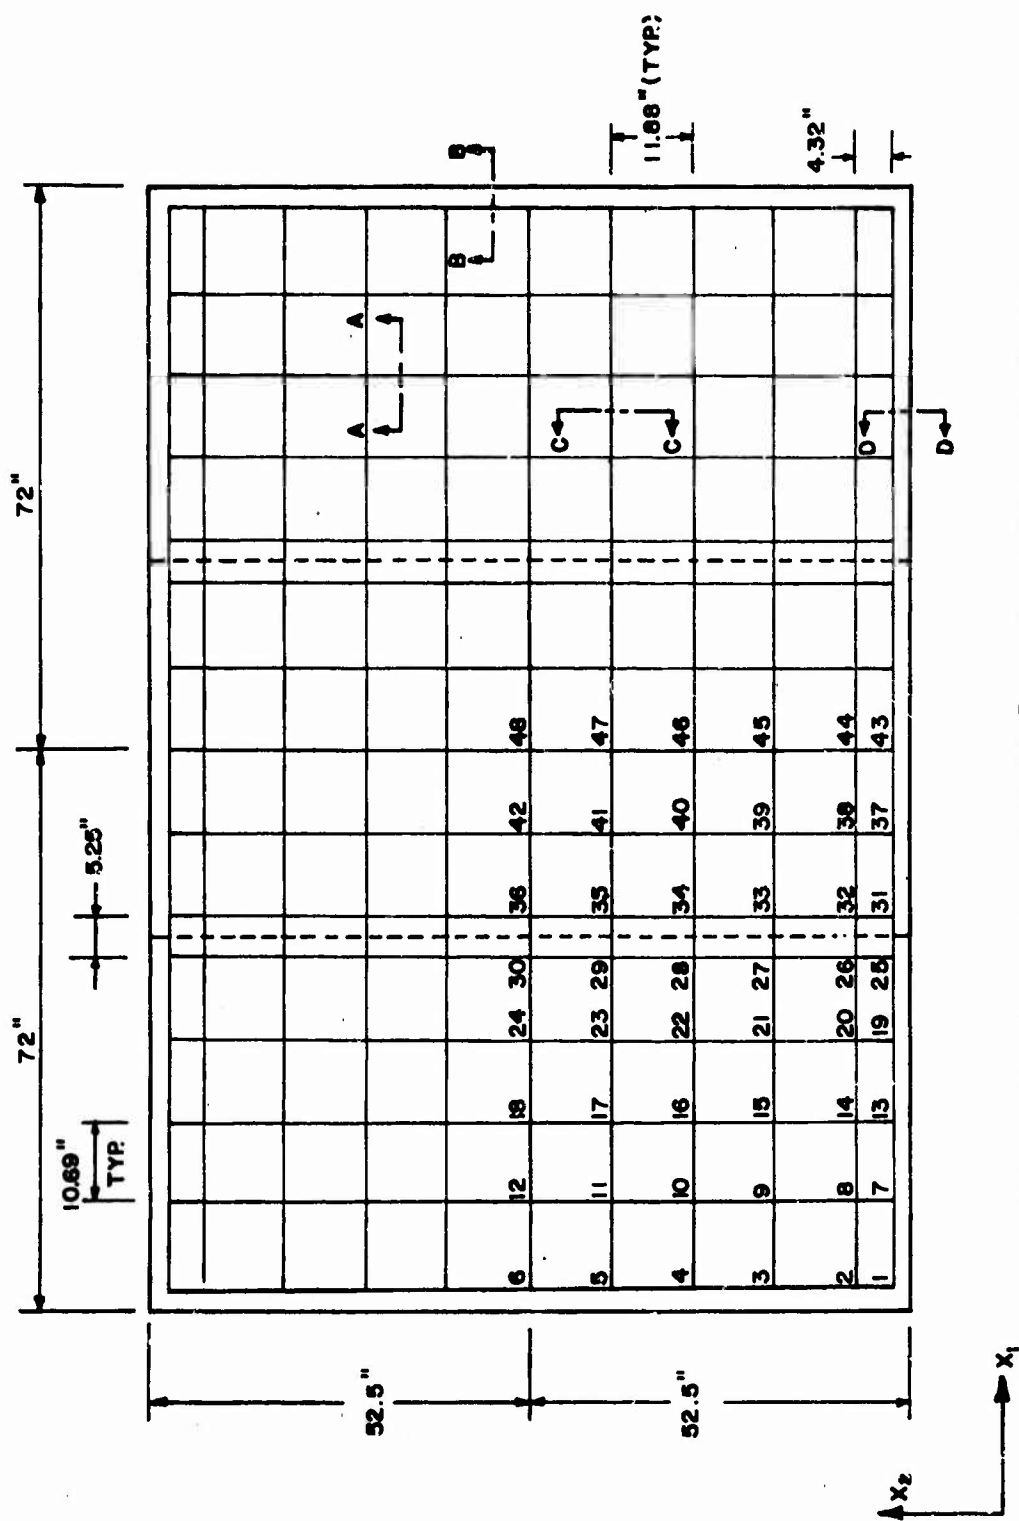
One-Quarter Grid Layout of Type IV Platform.
